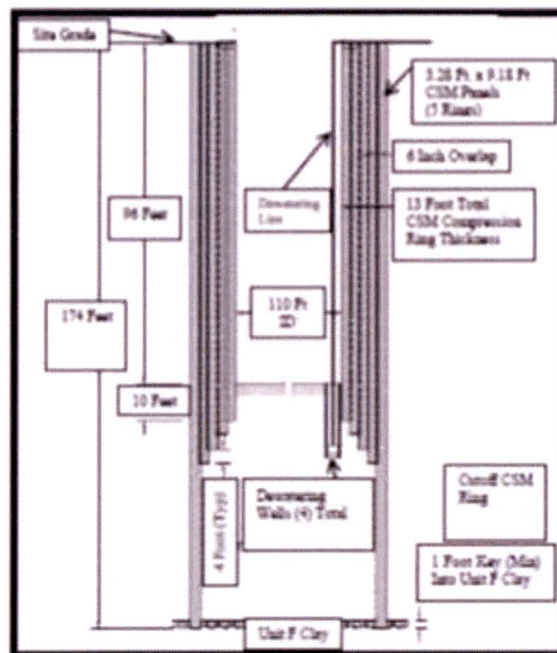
CSM Deep Shoring and Cutoff Wall (Section View)
